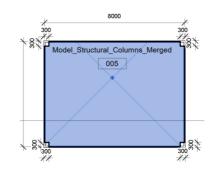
THE ROOM/SPACE DEFINITION OF THE BUILDING MODEL WITH STRUCTURAL COLUMNS IN THE CORNERS
